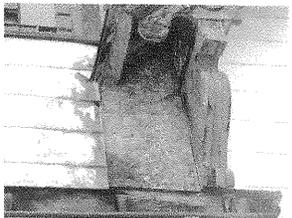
Bell Tower South West corner of Huron St. Missing siding, exposed underlayment, rotting and or missing wood, peeling paint.
